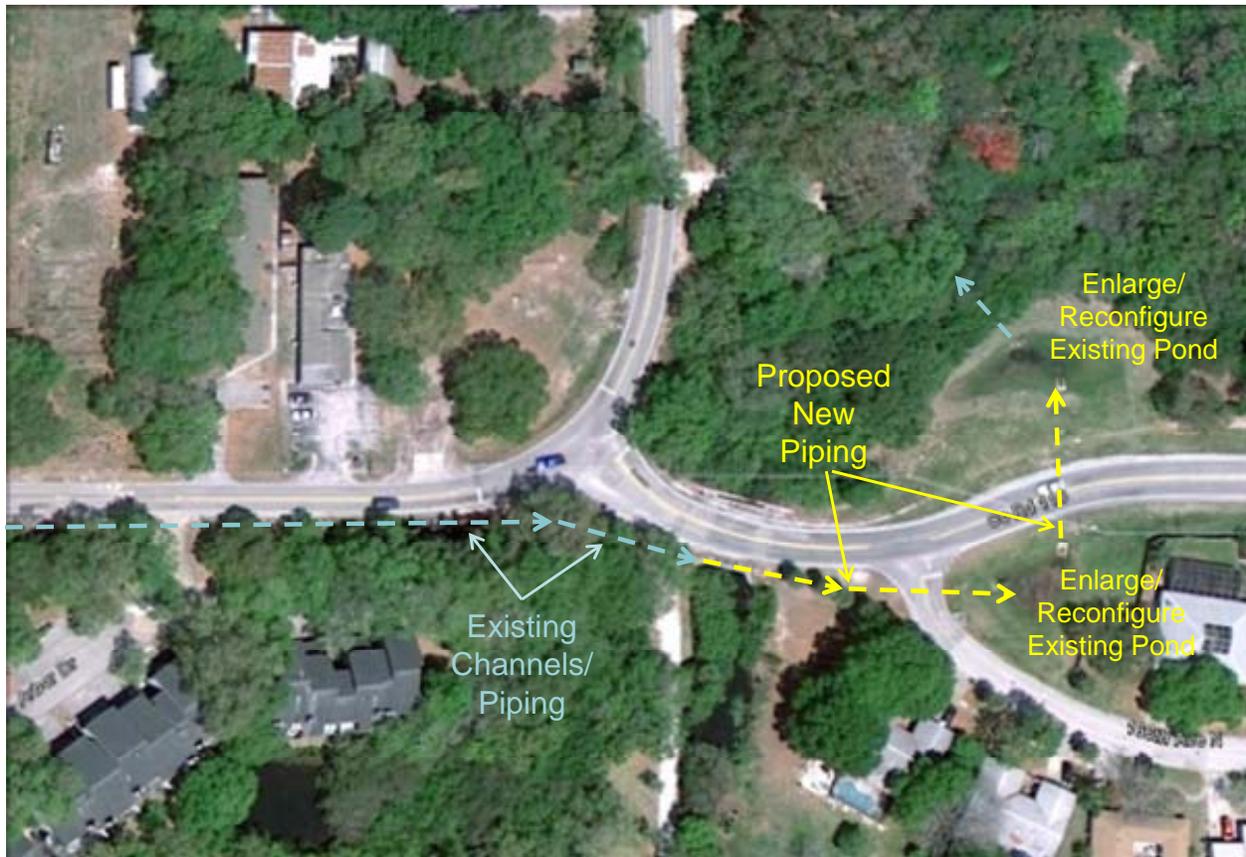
Conceptual Schematic of Proposed Treatment System for Whitney Road Drainage Swale.
